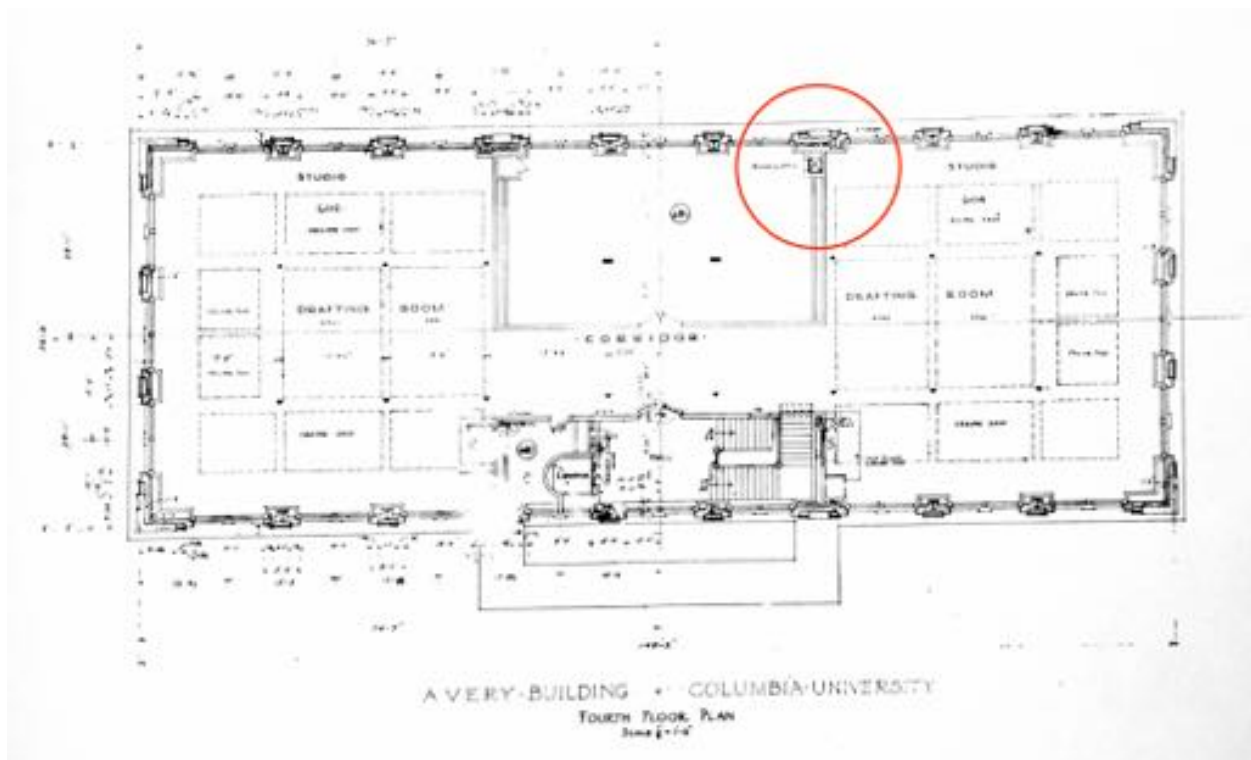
The book lifts in Avery Hall, fourth floor plan. From the Avery Hall Collection, Avery Archives, Columbia University.
